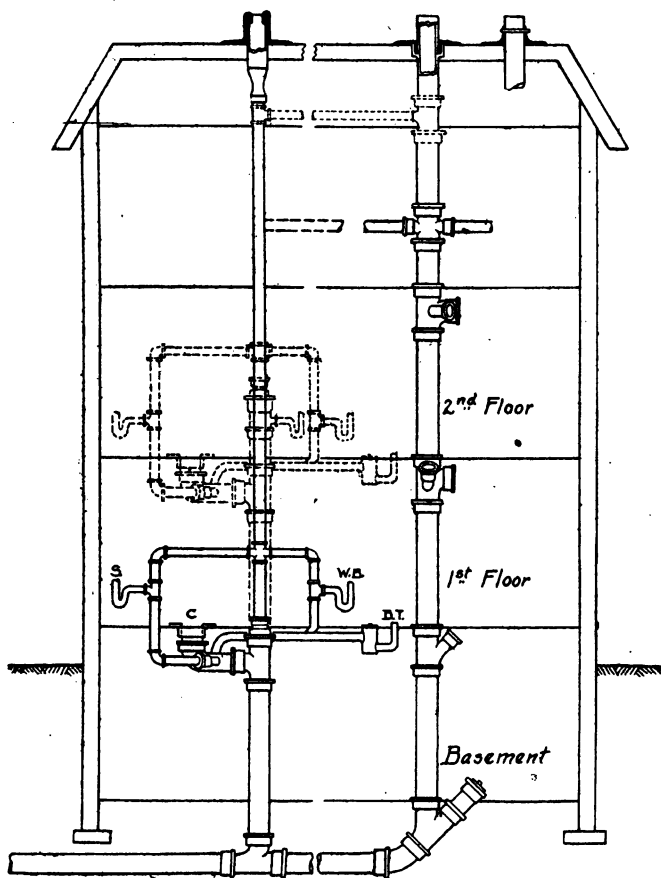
Showing typical method for a small school building (basement installation), drain connected to public sewer or approved sewage disposal system.
